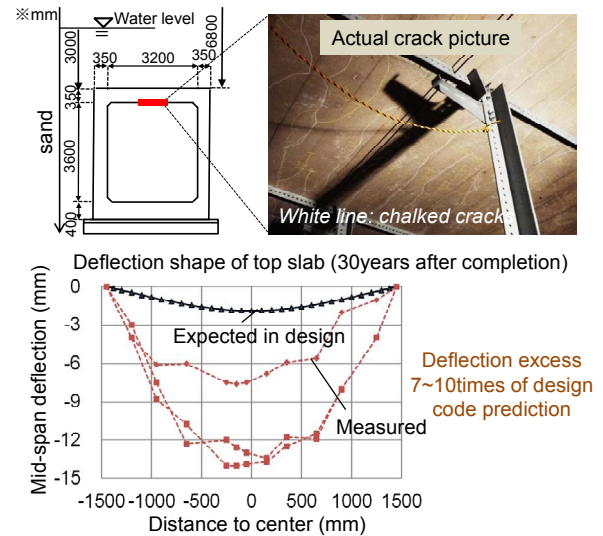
Long-term excessive deflection with cracks of underground RC culvert (Kunieda *et al.* 2014).
